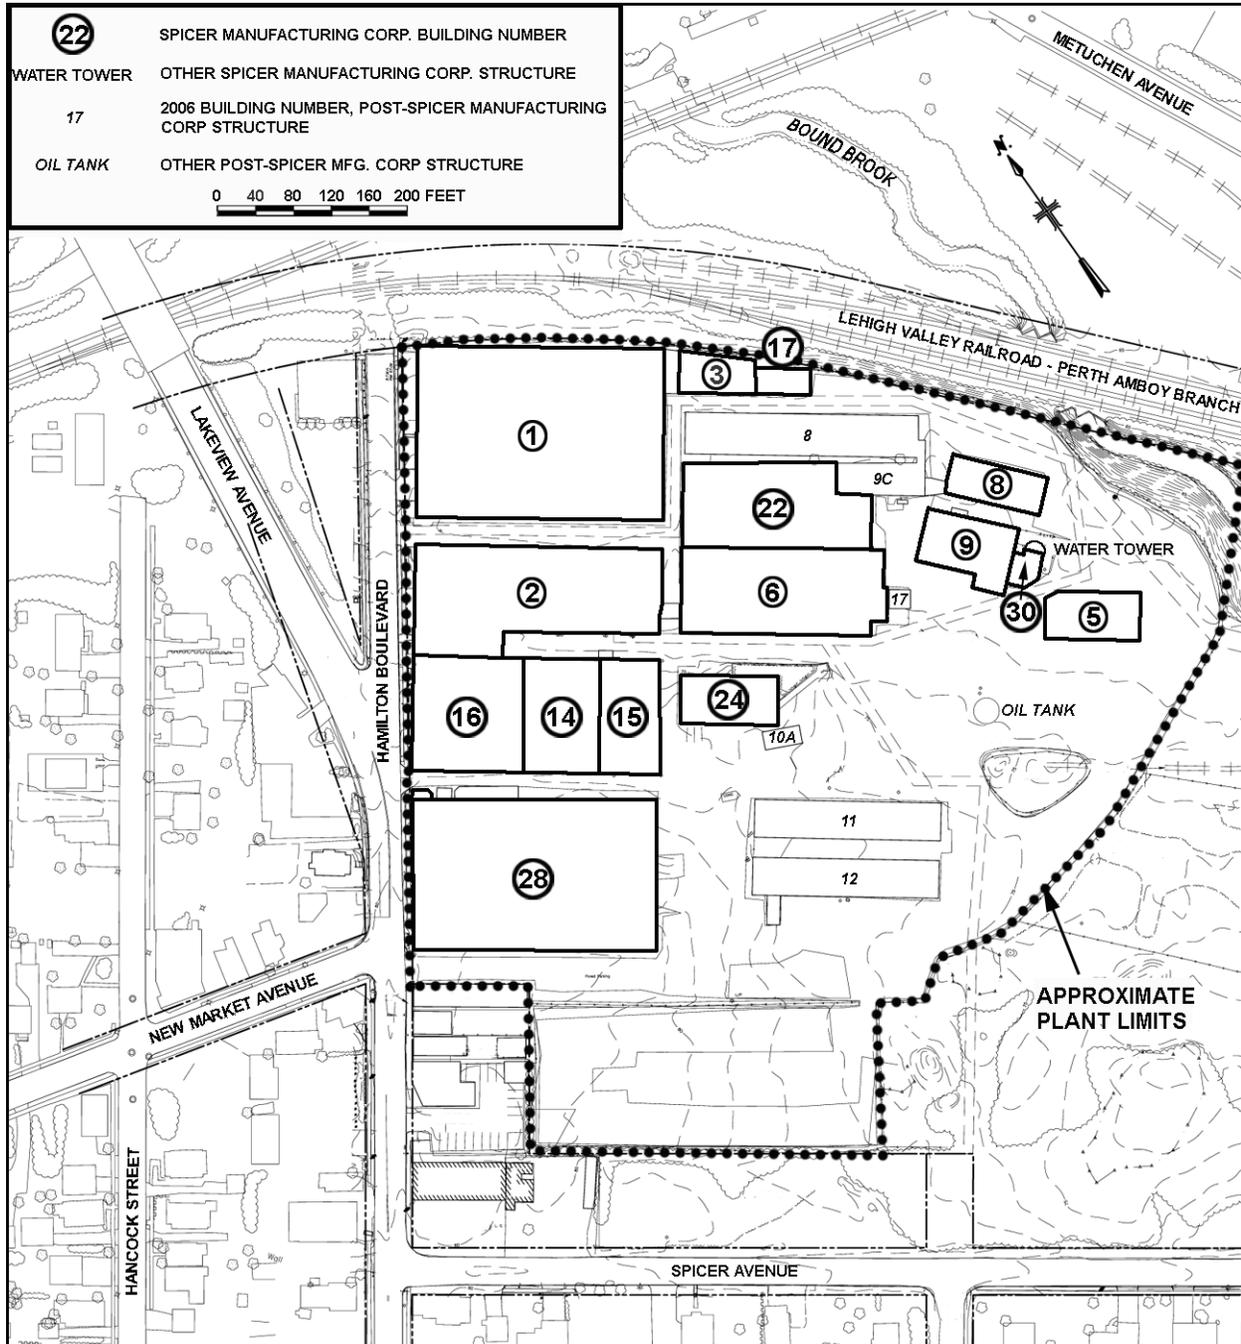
2006 BUILDING LOCATIONS AT FORMER SPICER MANUFACTURING CORP. PLANT
